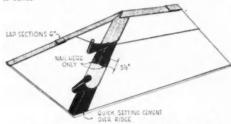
Hip and ridge roofing, concealed nail roll roofing
